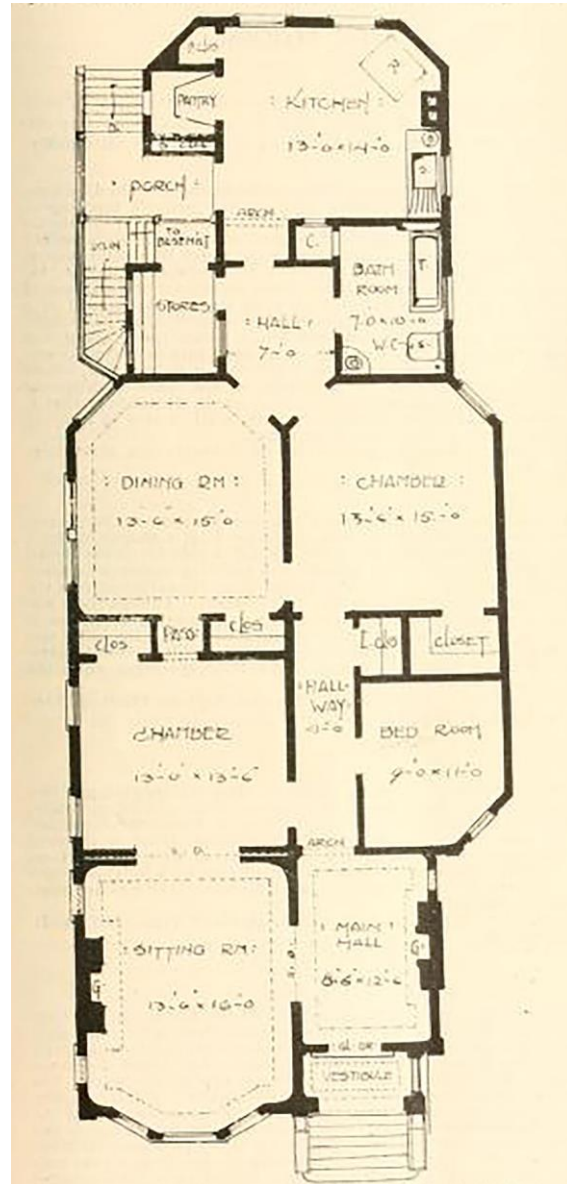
Floorplan of a cottage in the January 1895 edition of *California Architect & Building News*.
